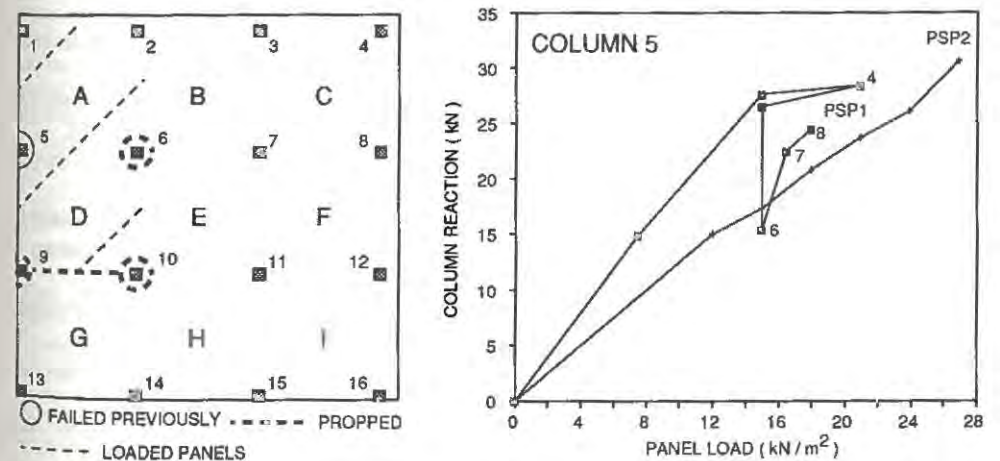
Post-punching test 2 (PSP2) and panel load v column reaction - Column 5 -
